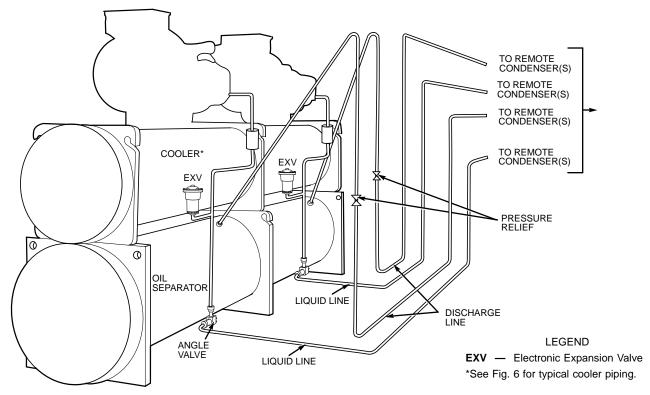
Typical 30HXA Refrigerant Piping to Remote Condenser
